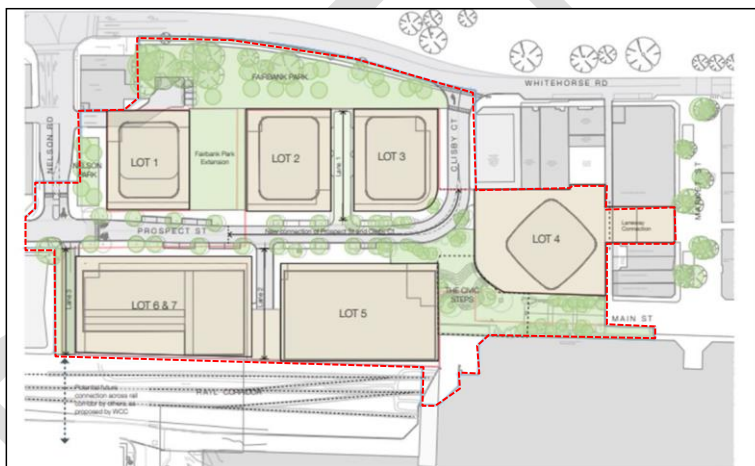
Development Plan, Box Hill Central North Master Plan (June 2022)
